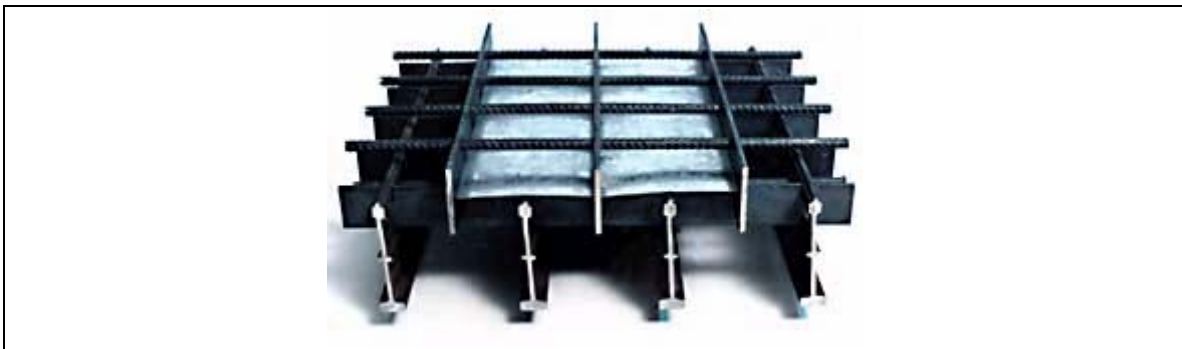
Concrete overlaid weld-less steel grid deck (IDSI, 2003)
